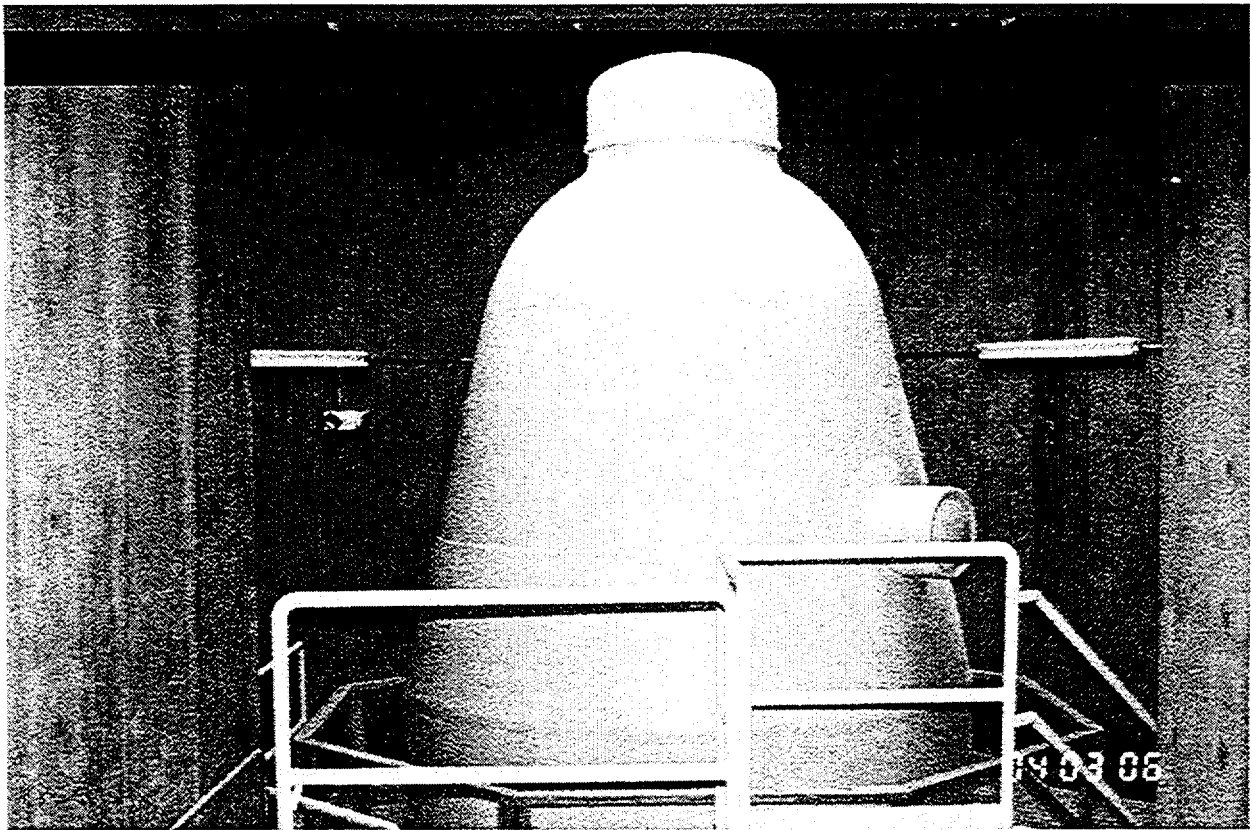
SCV model showing that the equipment hatch and the top head flange were welded shut.
